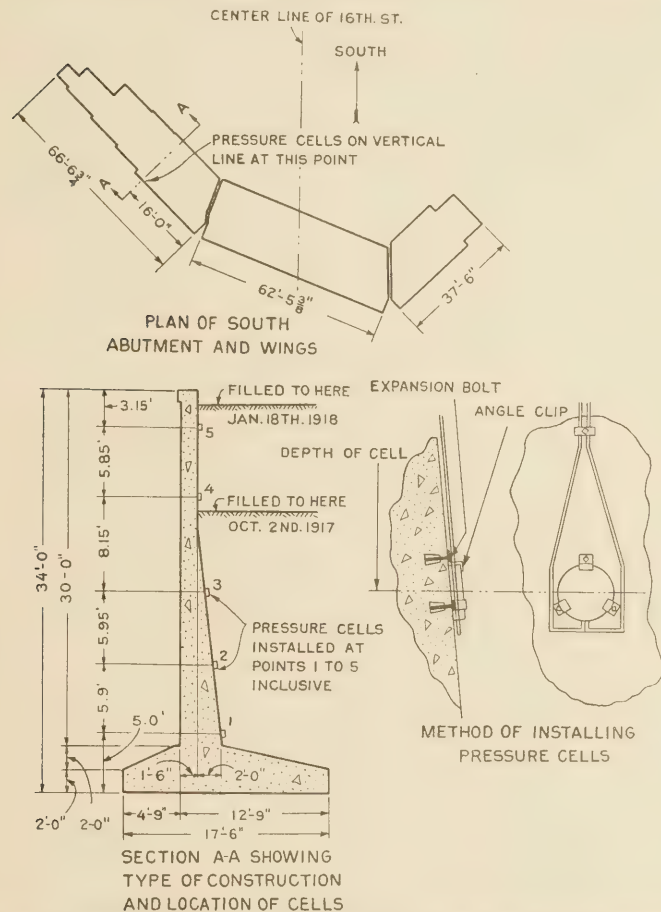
The plan of an abutment and a section of the wing wall of the Sixteenth Street Bridge
